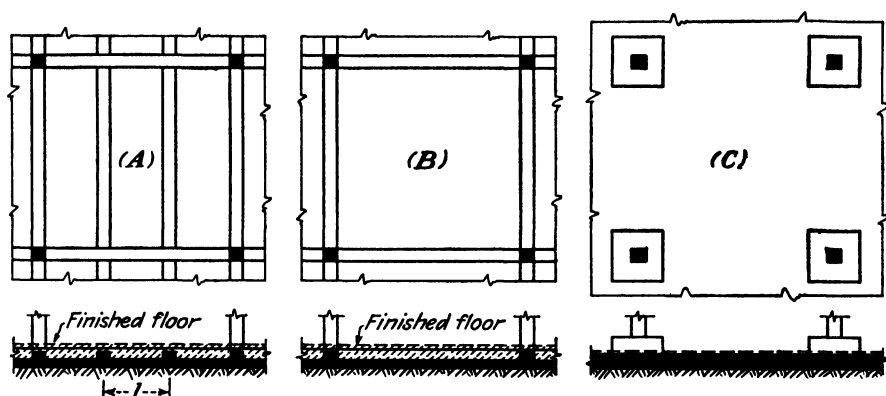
Three types of continuous reinforced-concrete foundation mats. (A) Panel of inverted T beams—one-way slabs. (B) Panel of inverted T beams—two-way slabs. (C) Panel of inverted flat slabs.
